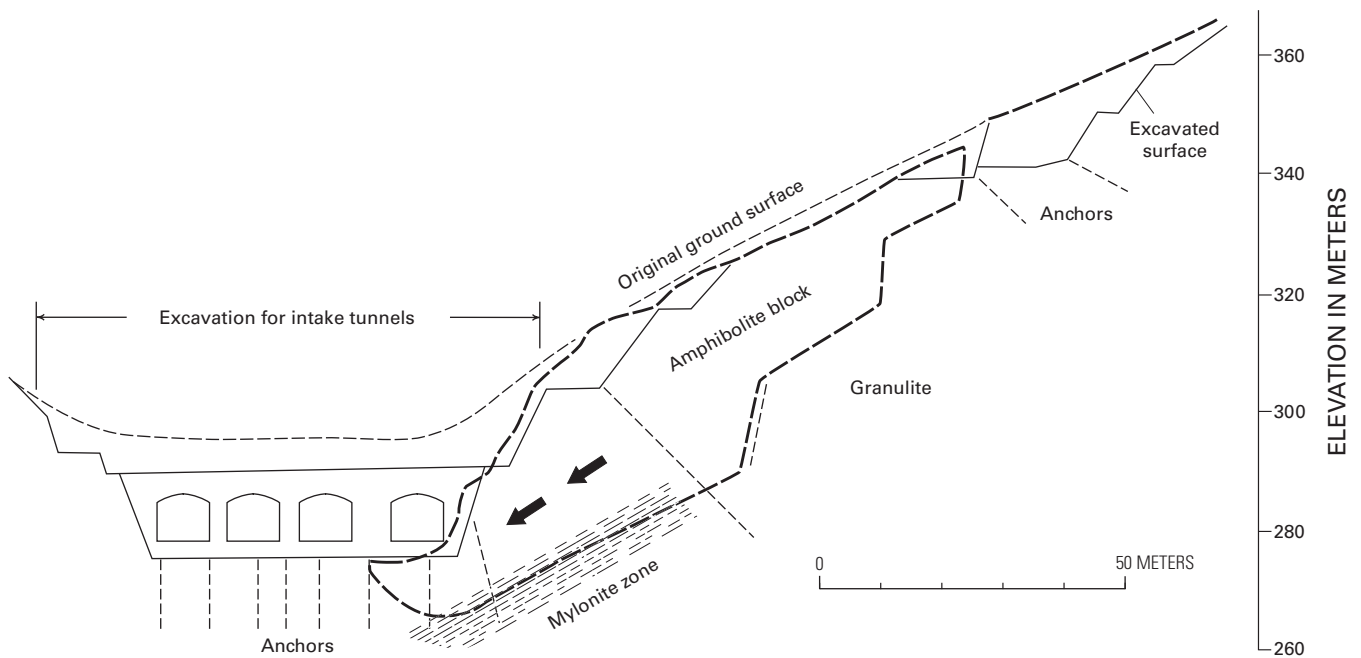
Simplified cross-valley cross section through Dalešice Dam, Jihlava River, Czech Republic. Construction caused reactivation of a rock slide of the amphibolite in the right abutment. This cross section shows locations of remedial excavations and rock anchors. Modified from Záruba and Mencl (1982, p. 246).
